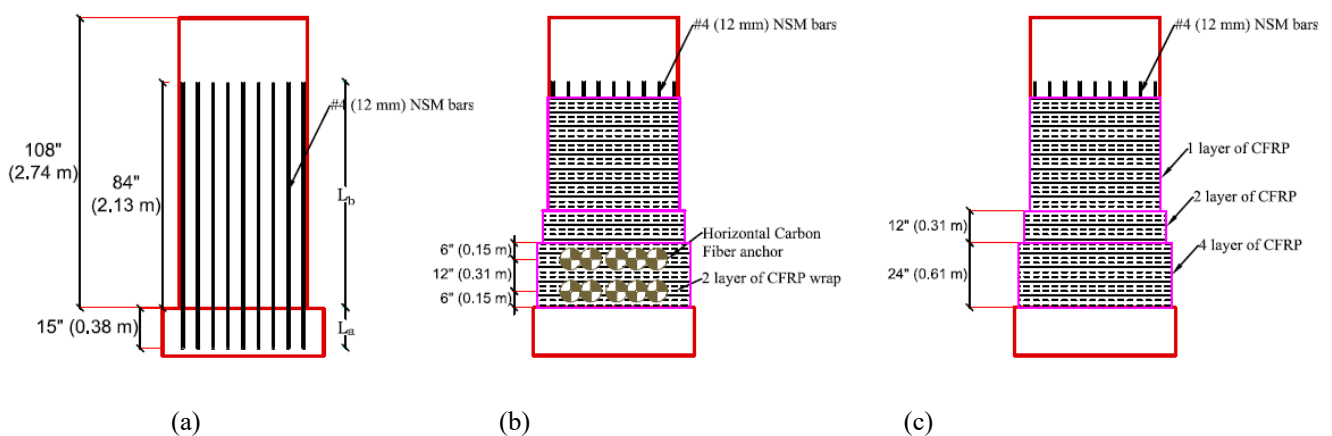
Retrofit design; (a) NSM CFRP rods, (b) horizontal CFRP anchors, (c) hoop direction CFRP wraps
